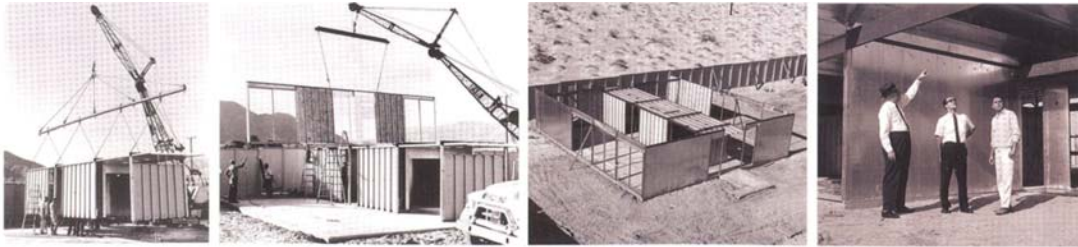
Prefabricated Steel Erection and Construction, Steel Houses, Donald Wexler, 1962
